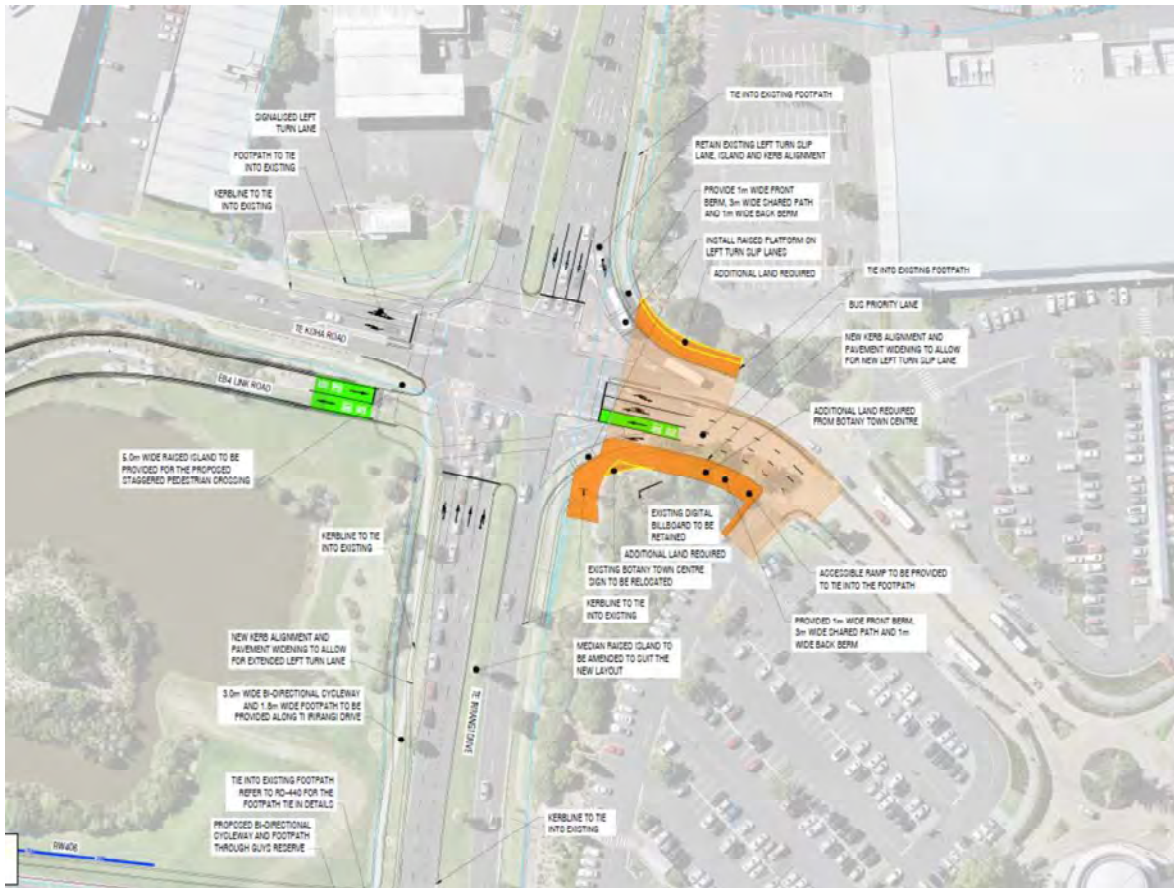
Proposed Intersection improvements on Te Irirangi Drive/Town Centre Drive.
